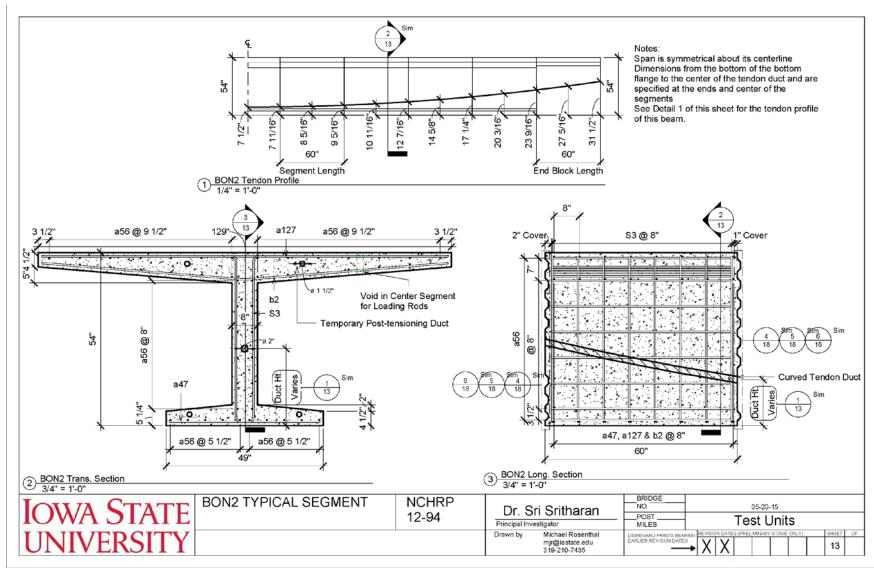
BON2 Typical Longitudinal and Transverse Section
